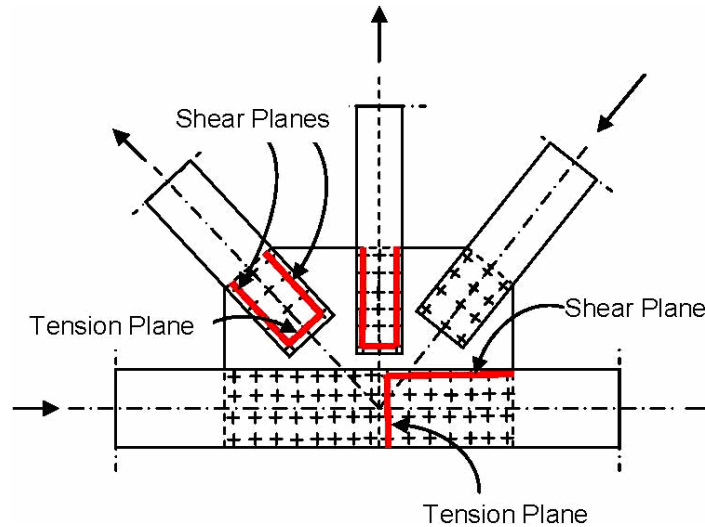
Examples of potential block shear rupture planes for gusset plates in tension
